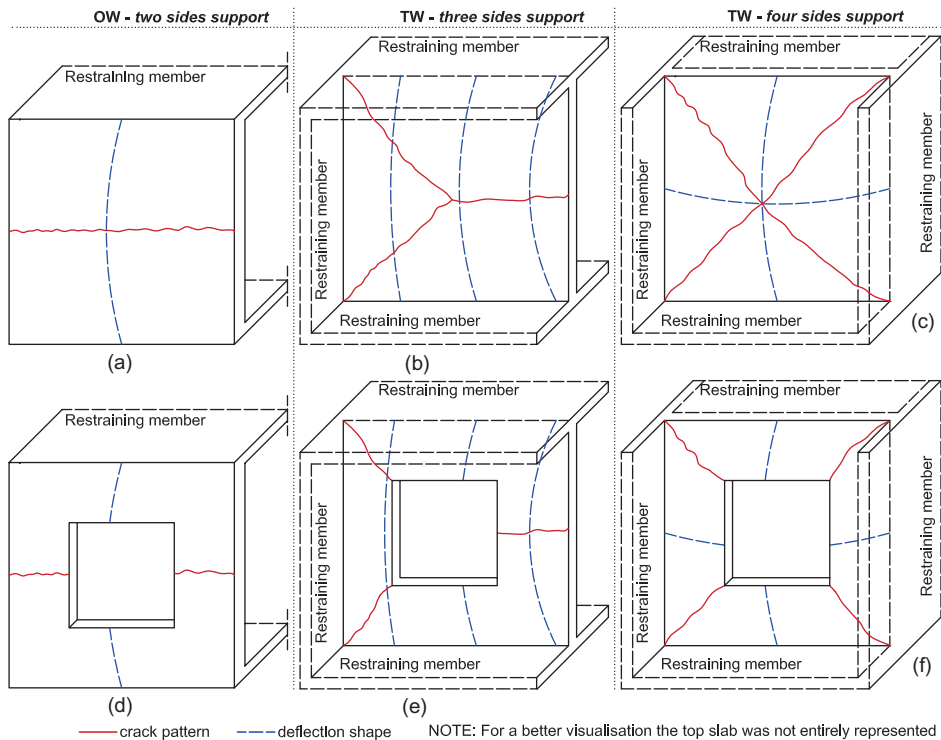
Typical crack pattern and deflection shape of axially loaded RC walls.
